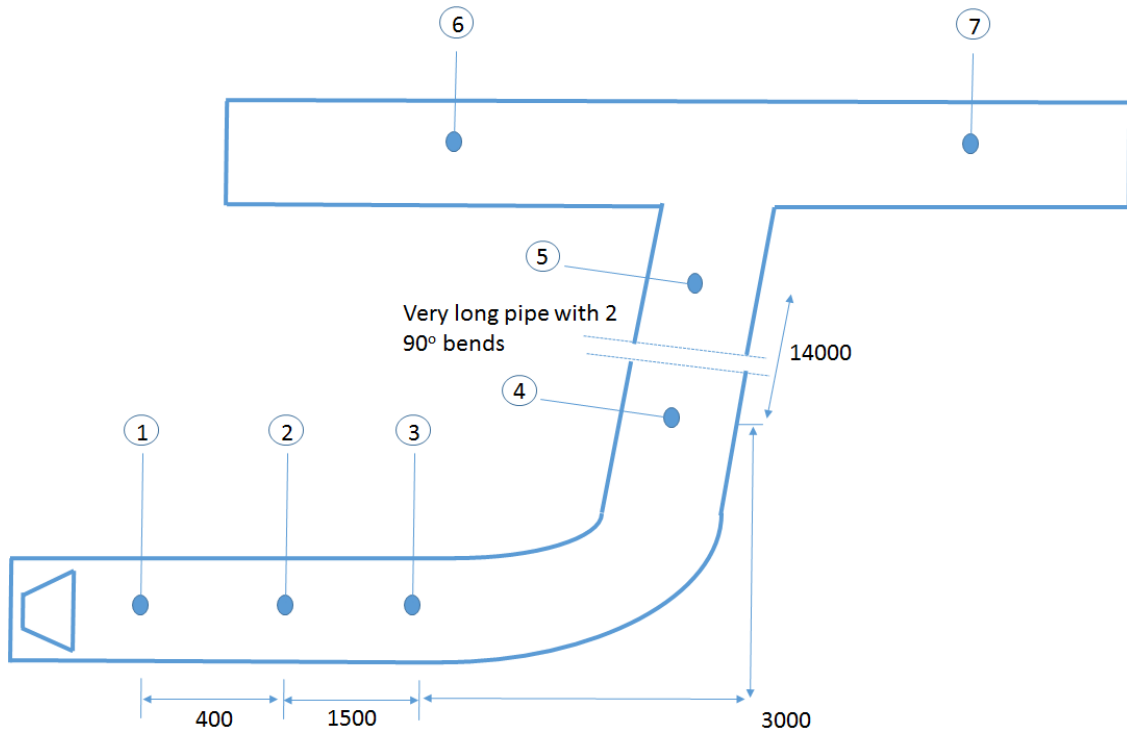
Schematic of the long pipe section at SGN Northam (Dimensions are in cm) (not to scale)
